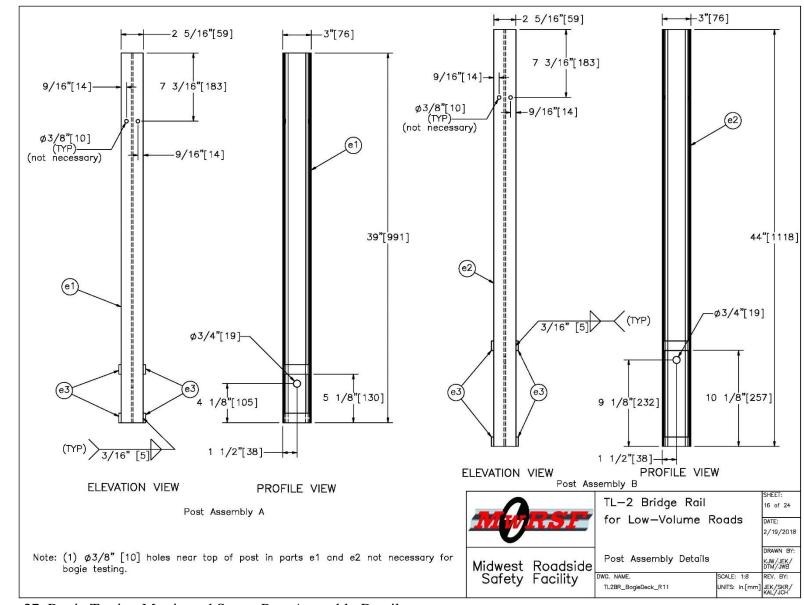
Bogie Testing Matrix and Setup, Post Assembly Details
